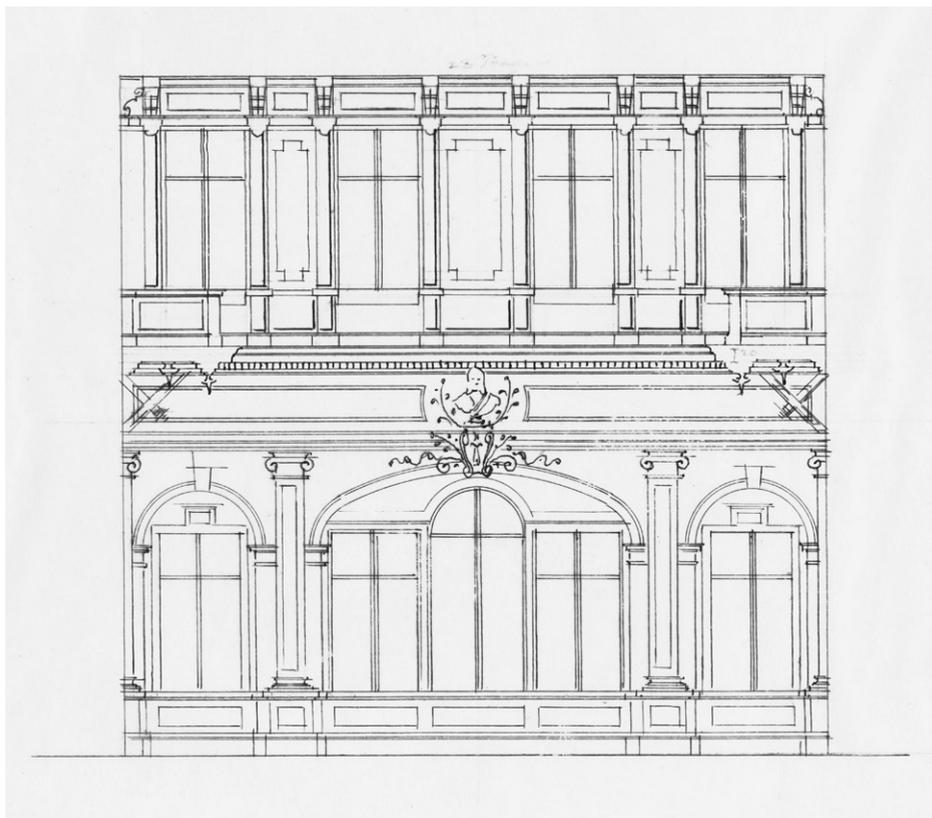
Plan of the chamber wall in Ljubljana's Town Hall, 1896–1898.
